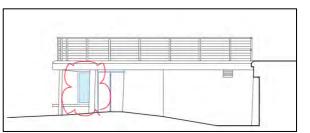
Proposed modifications to south elevation of First Aid Facilities.
